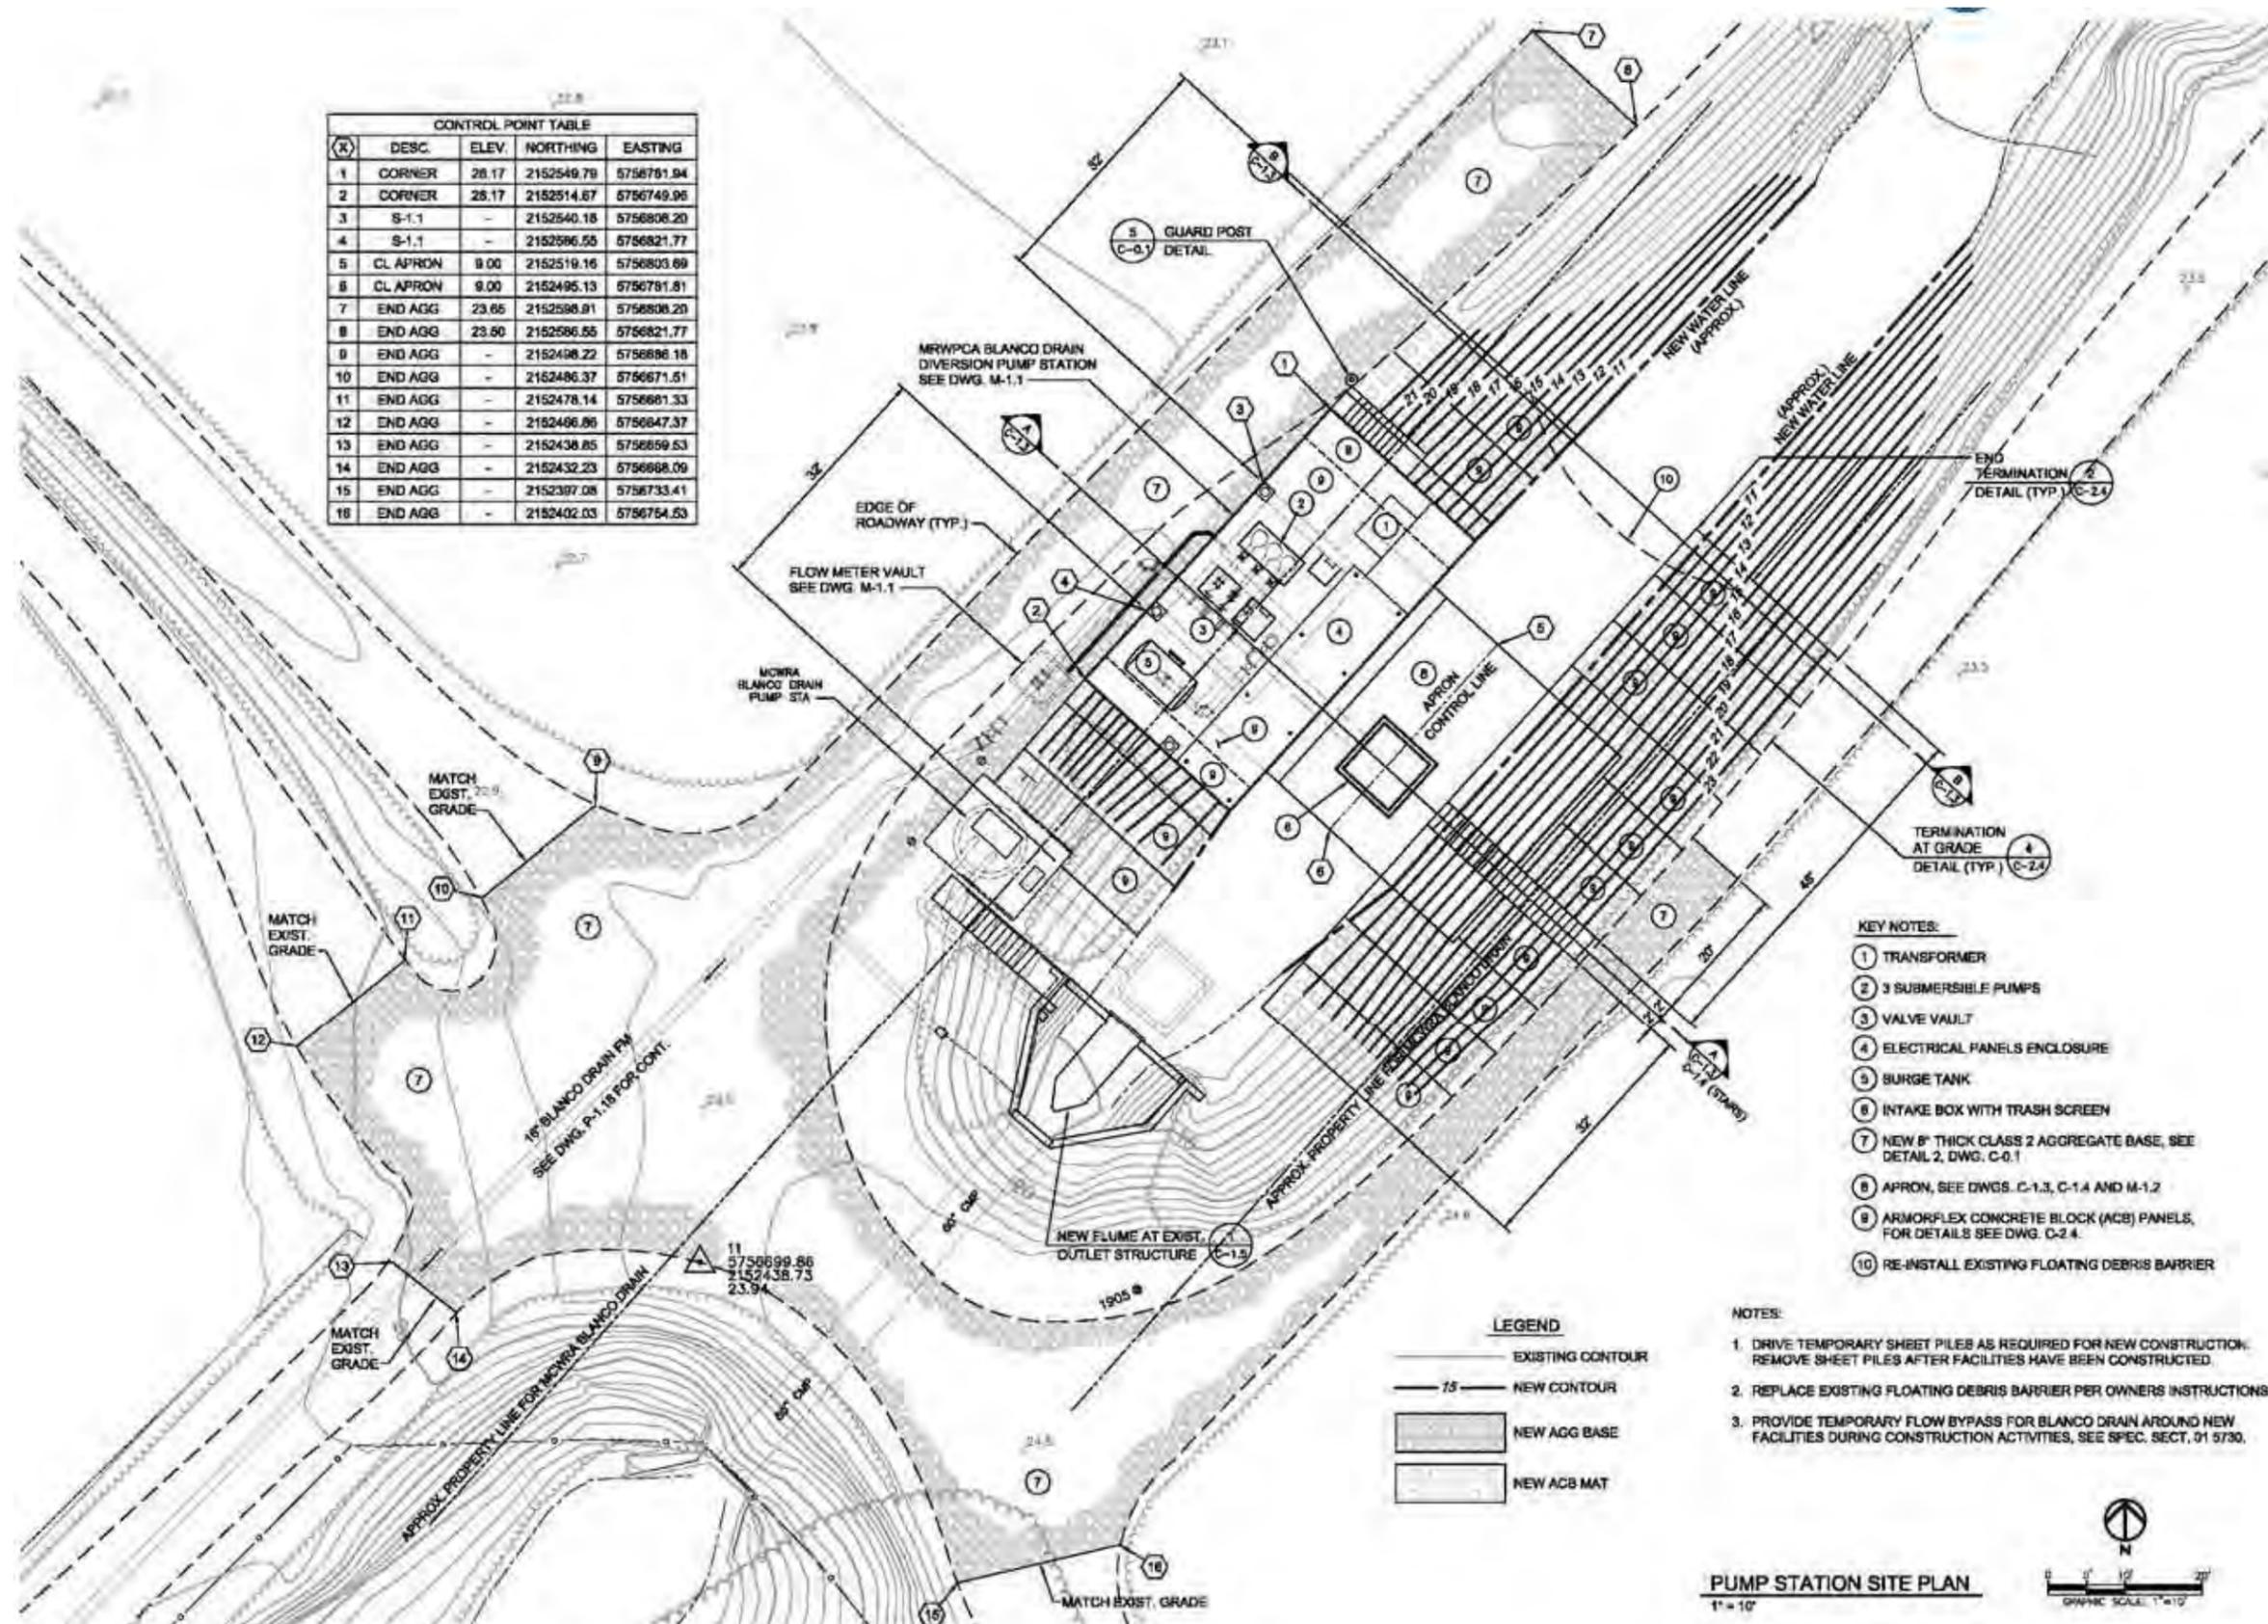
Details of Proposed Blanco Drain Diversion Facilities
